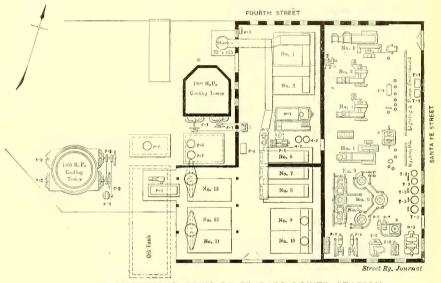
NEW GENERAL PLAN OF EL PASO POWER STATION
